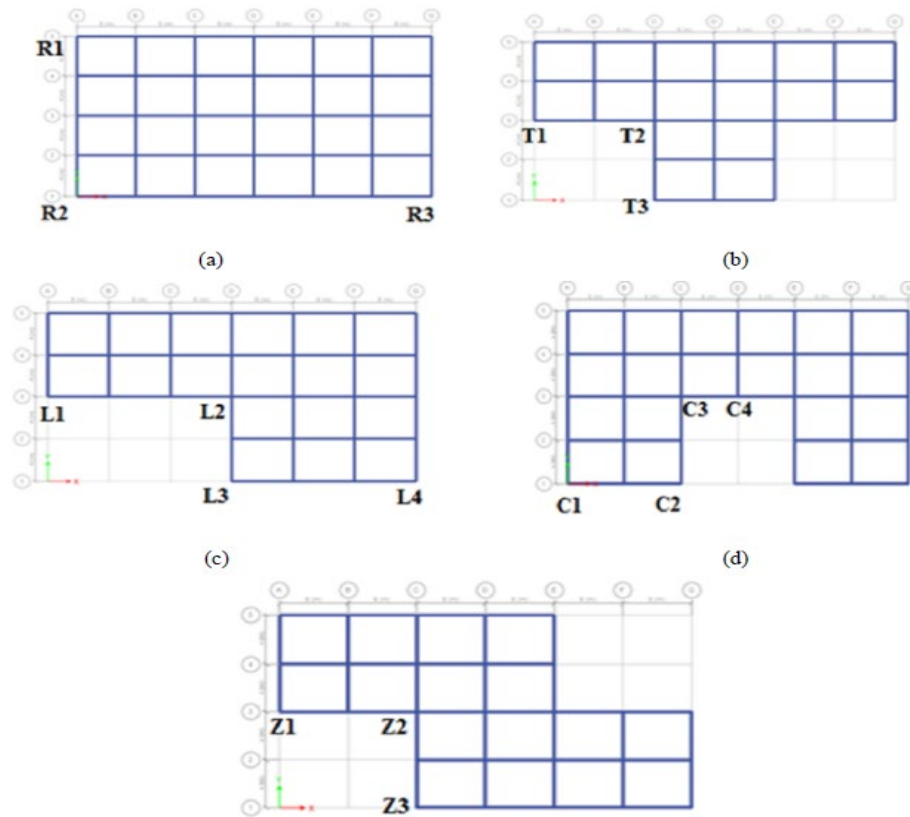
Plan Irregularity of studied building models (Joshy and Santhi, 2018)
